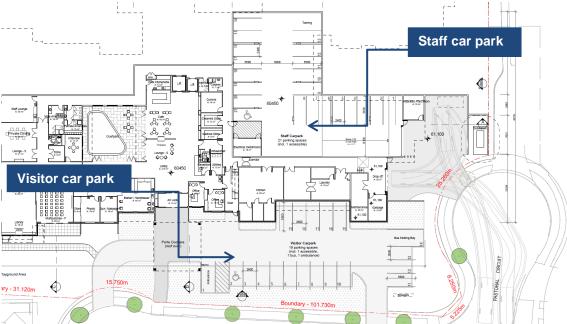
Lower Ground Floor Plan illustrating proposed parking spaces –Prepared by prepared by Calder Flower Architects
